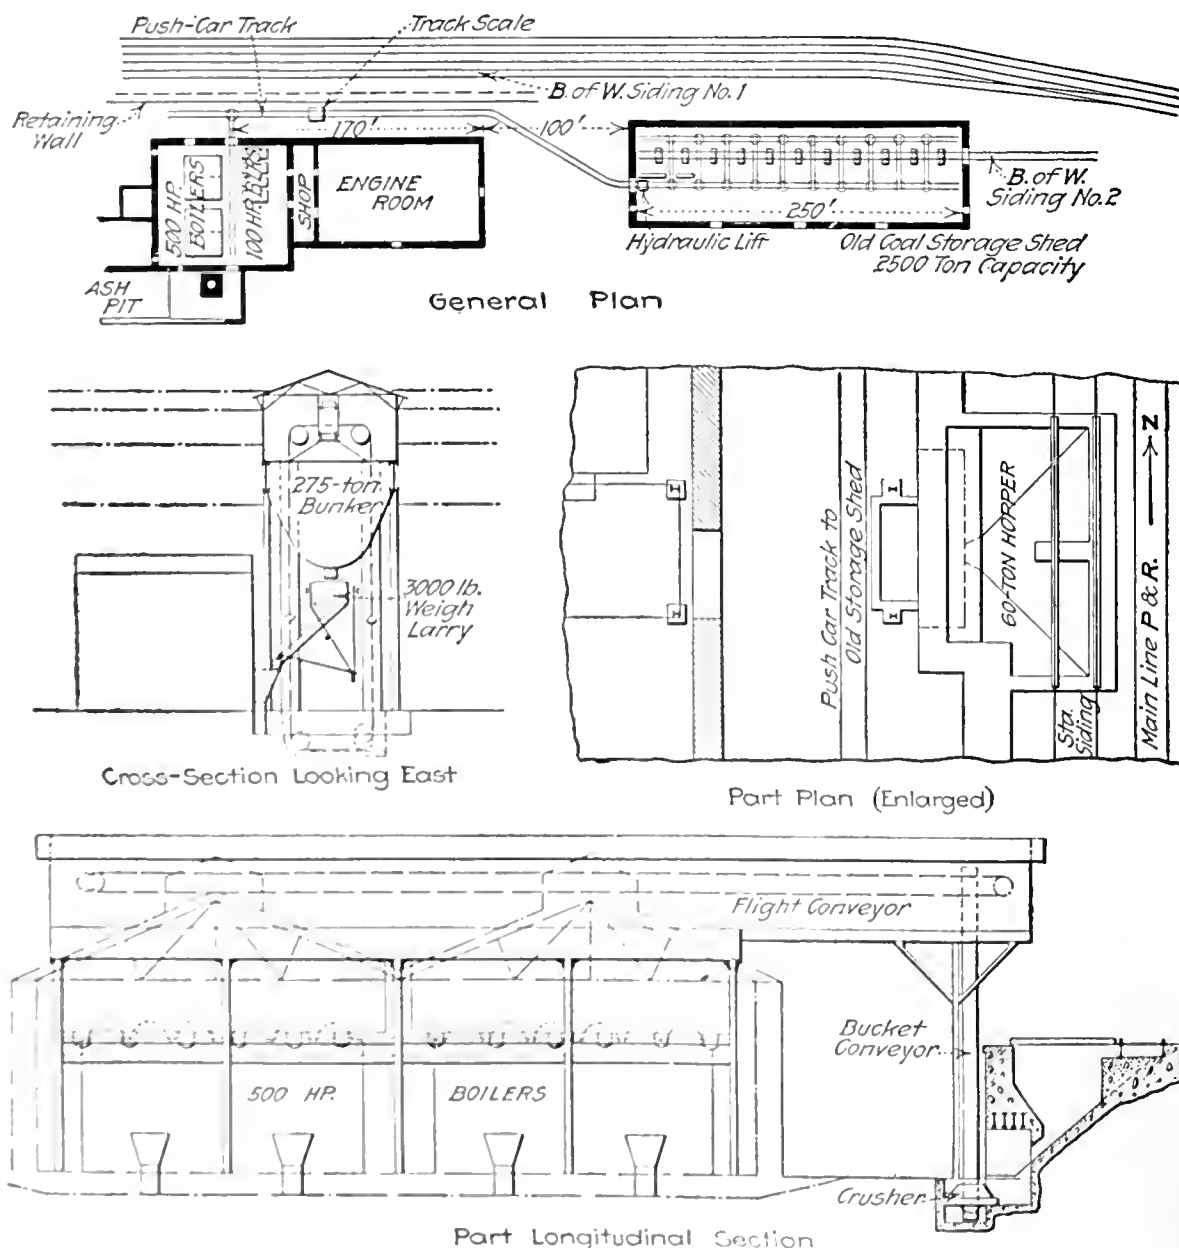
PLAN AND DETAIL OF COAL-HANDLING PLANT AT SHAWMONT STATION
